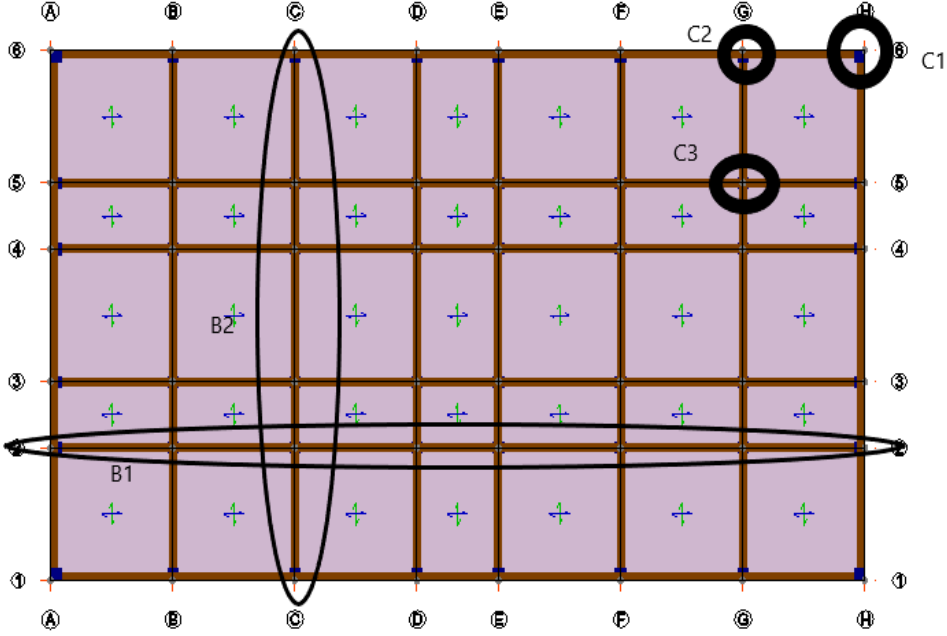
Location of Beam B1, Beam B2, Column C1, Column C2 and Column C3
